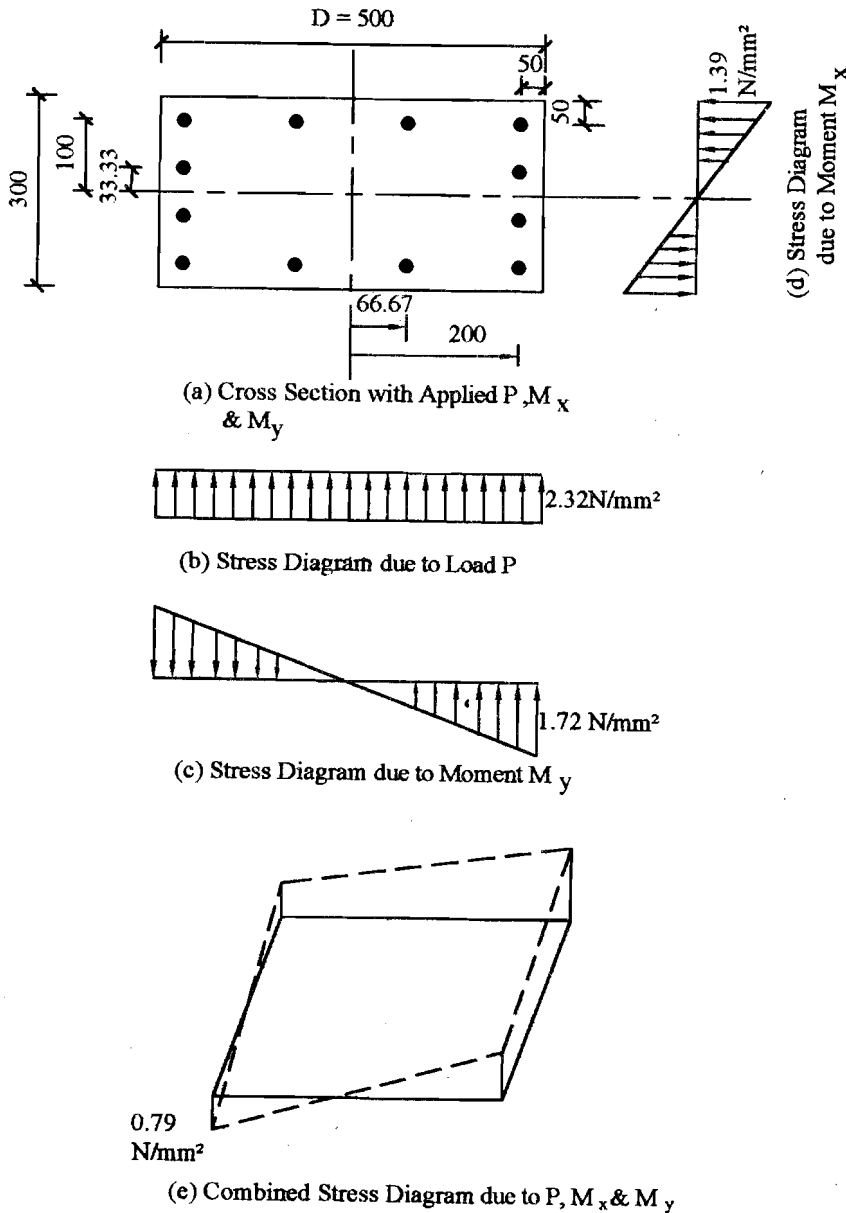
Stress Diagram Due to Direct Load & Biaxial Bending for Uncracked Section
